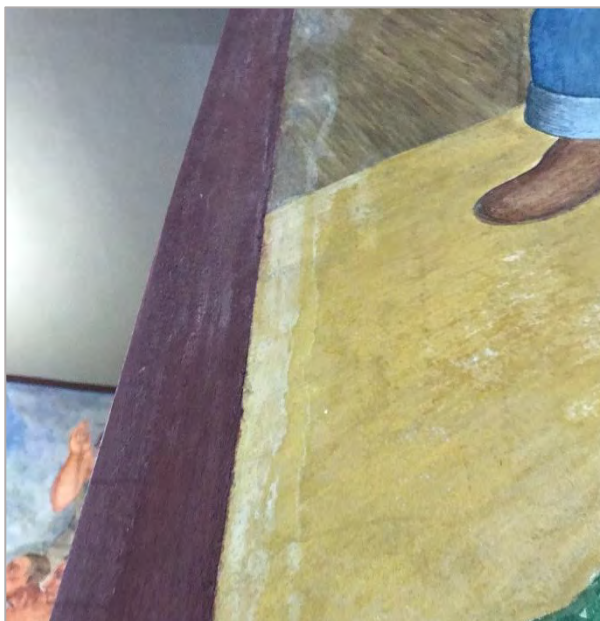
Detail of efflorescence on the *Outdoor Life* mural. Notice pattern followed by water coming from ceiling.
